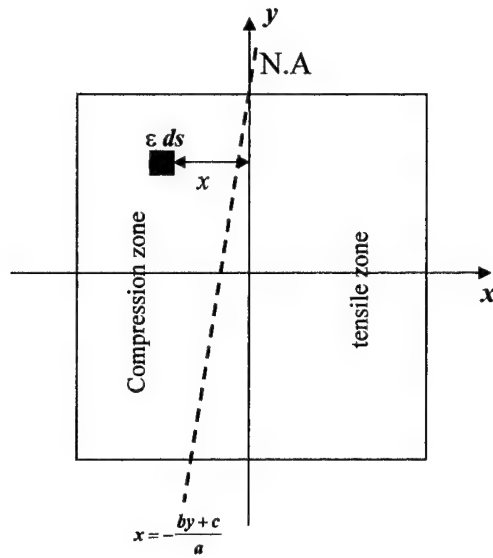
Schematic drawing of a typical cross section of concrete frames.
